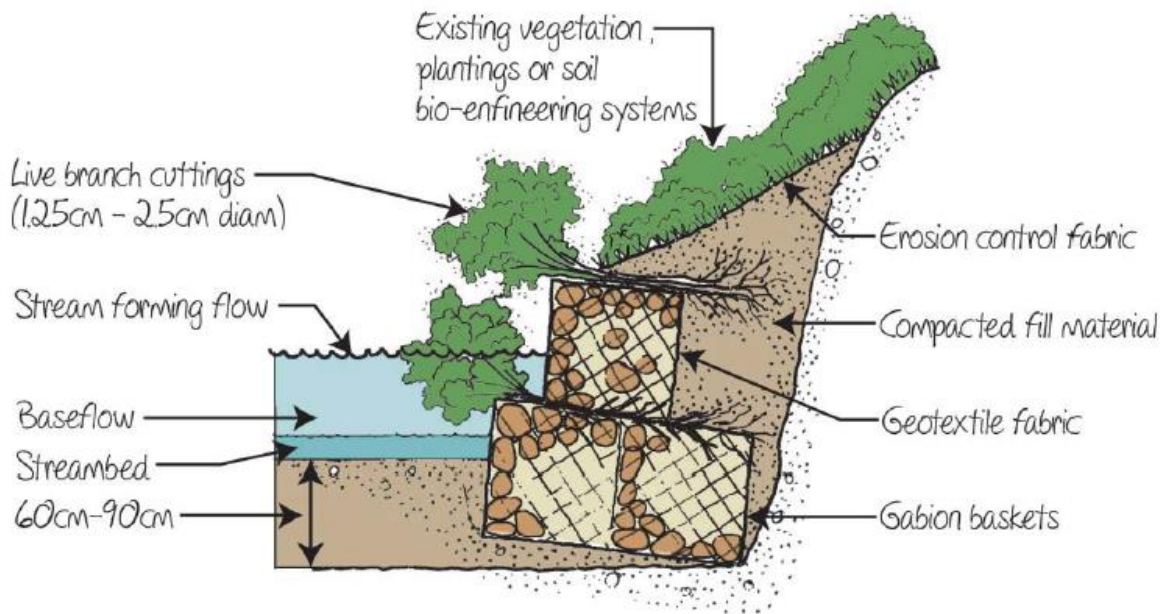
Cross section of a gabion retaining wall with vegetation planted through it (Day *et al.*, 2016).
